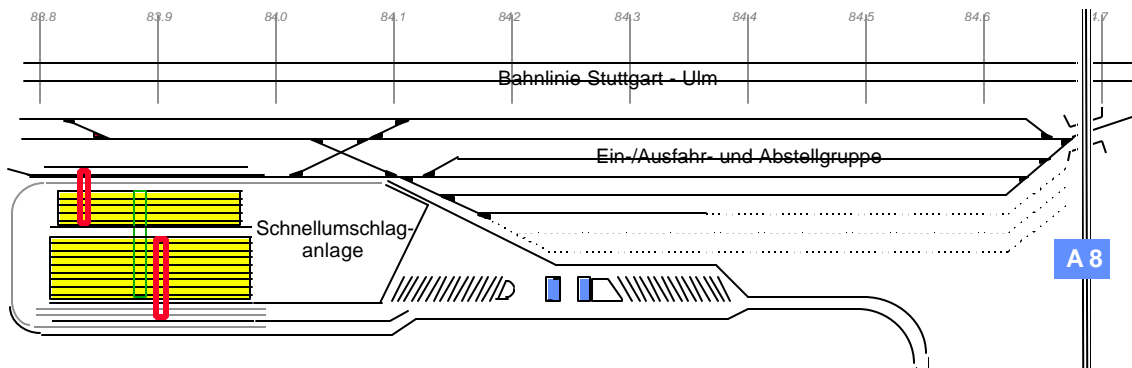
Layout of Krupp Fast Handling System
